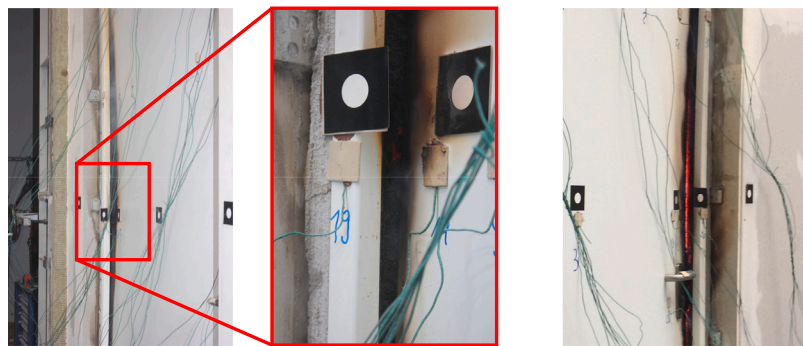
Failure of the bolt connection between door and frame (left) and door lock (right) for the case DC.
